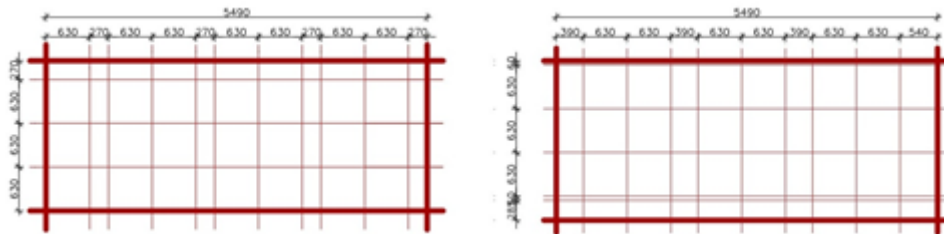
Old dimensions of modules (left) and New dimensions of modules (right)
